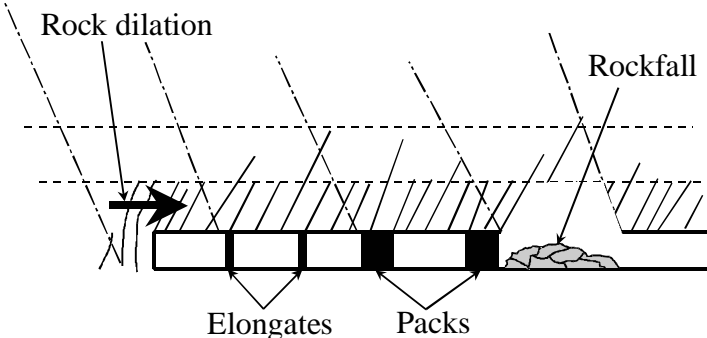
Stope with a back area rockfall leading to reduced hangingwall confinement.
